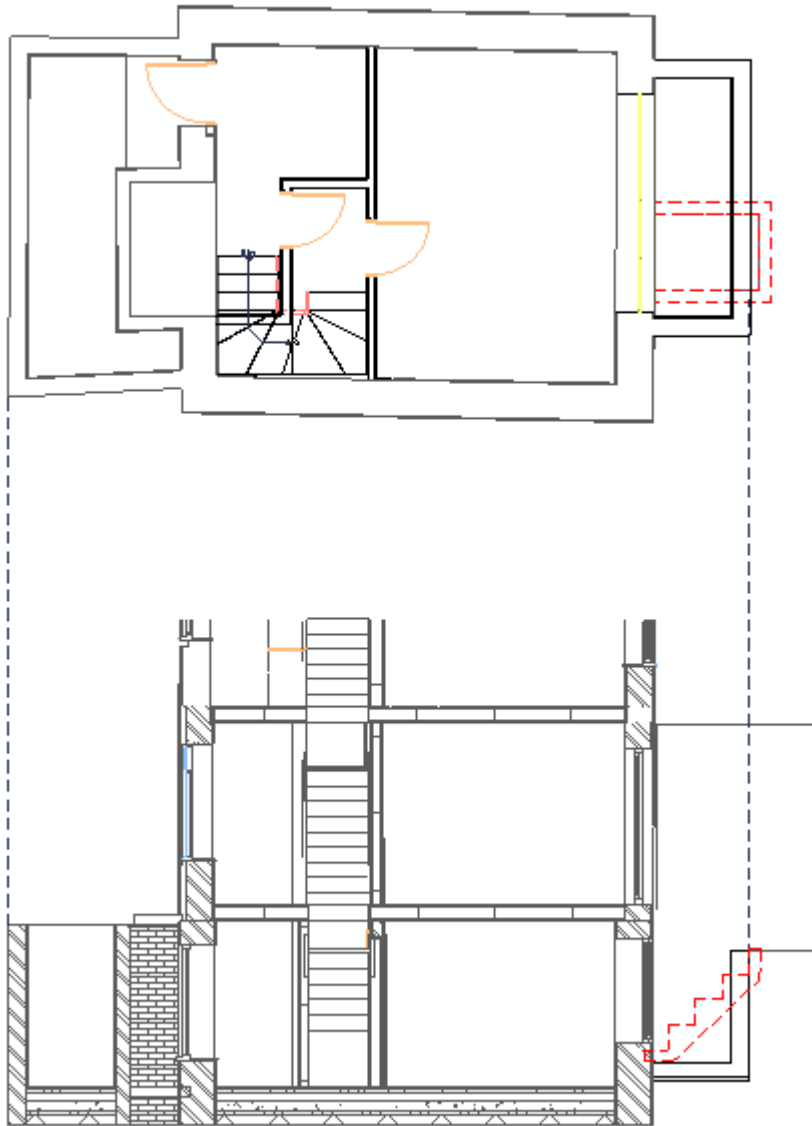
Proposed Lightwell/Basement Floor Plan and Section
